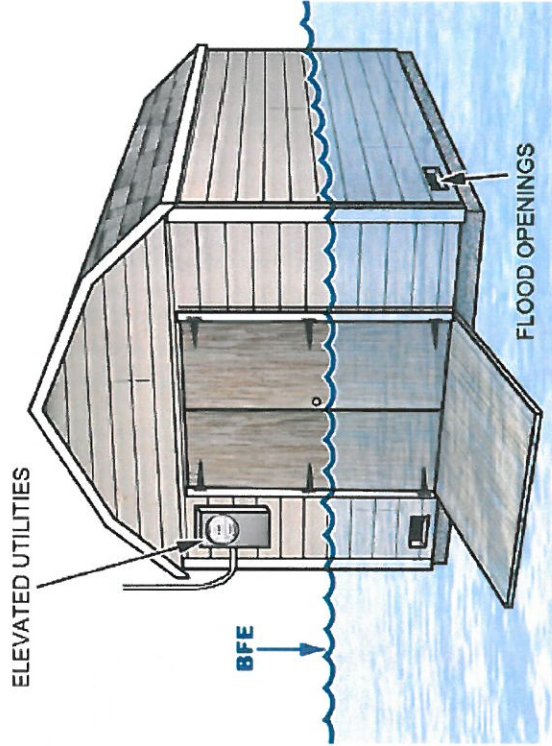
Accessory structure with flood openings and utilities elevated above the BFE
